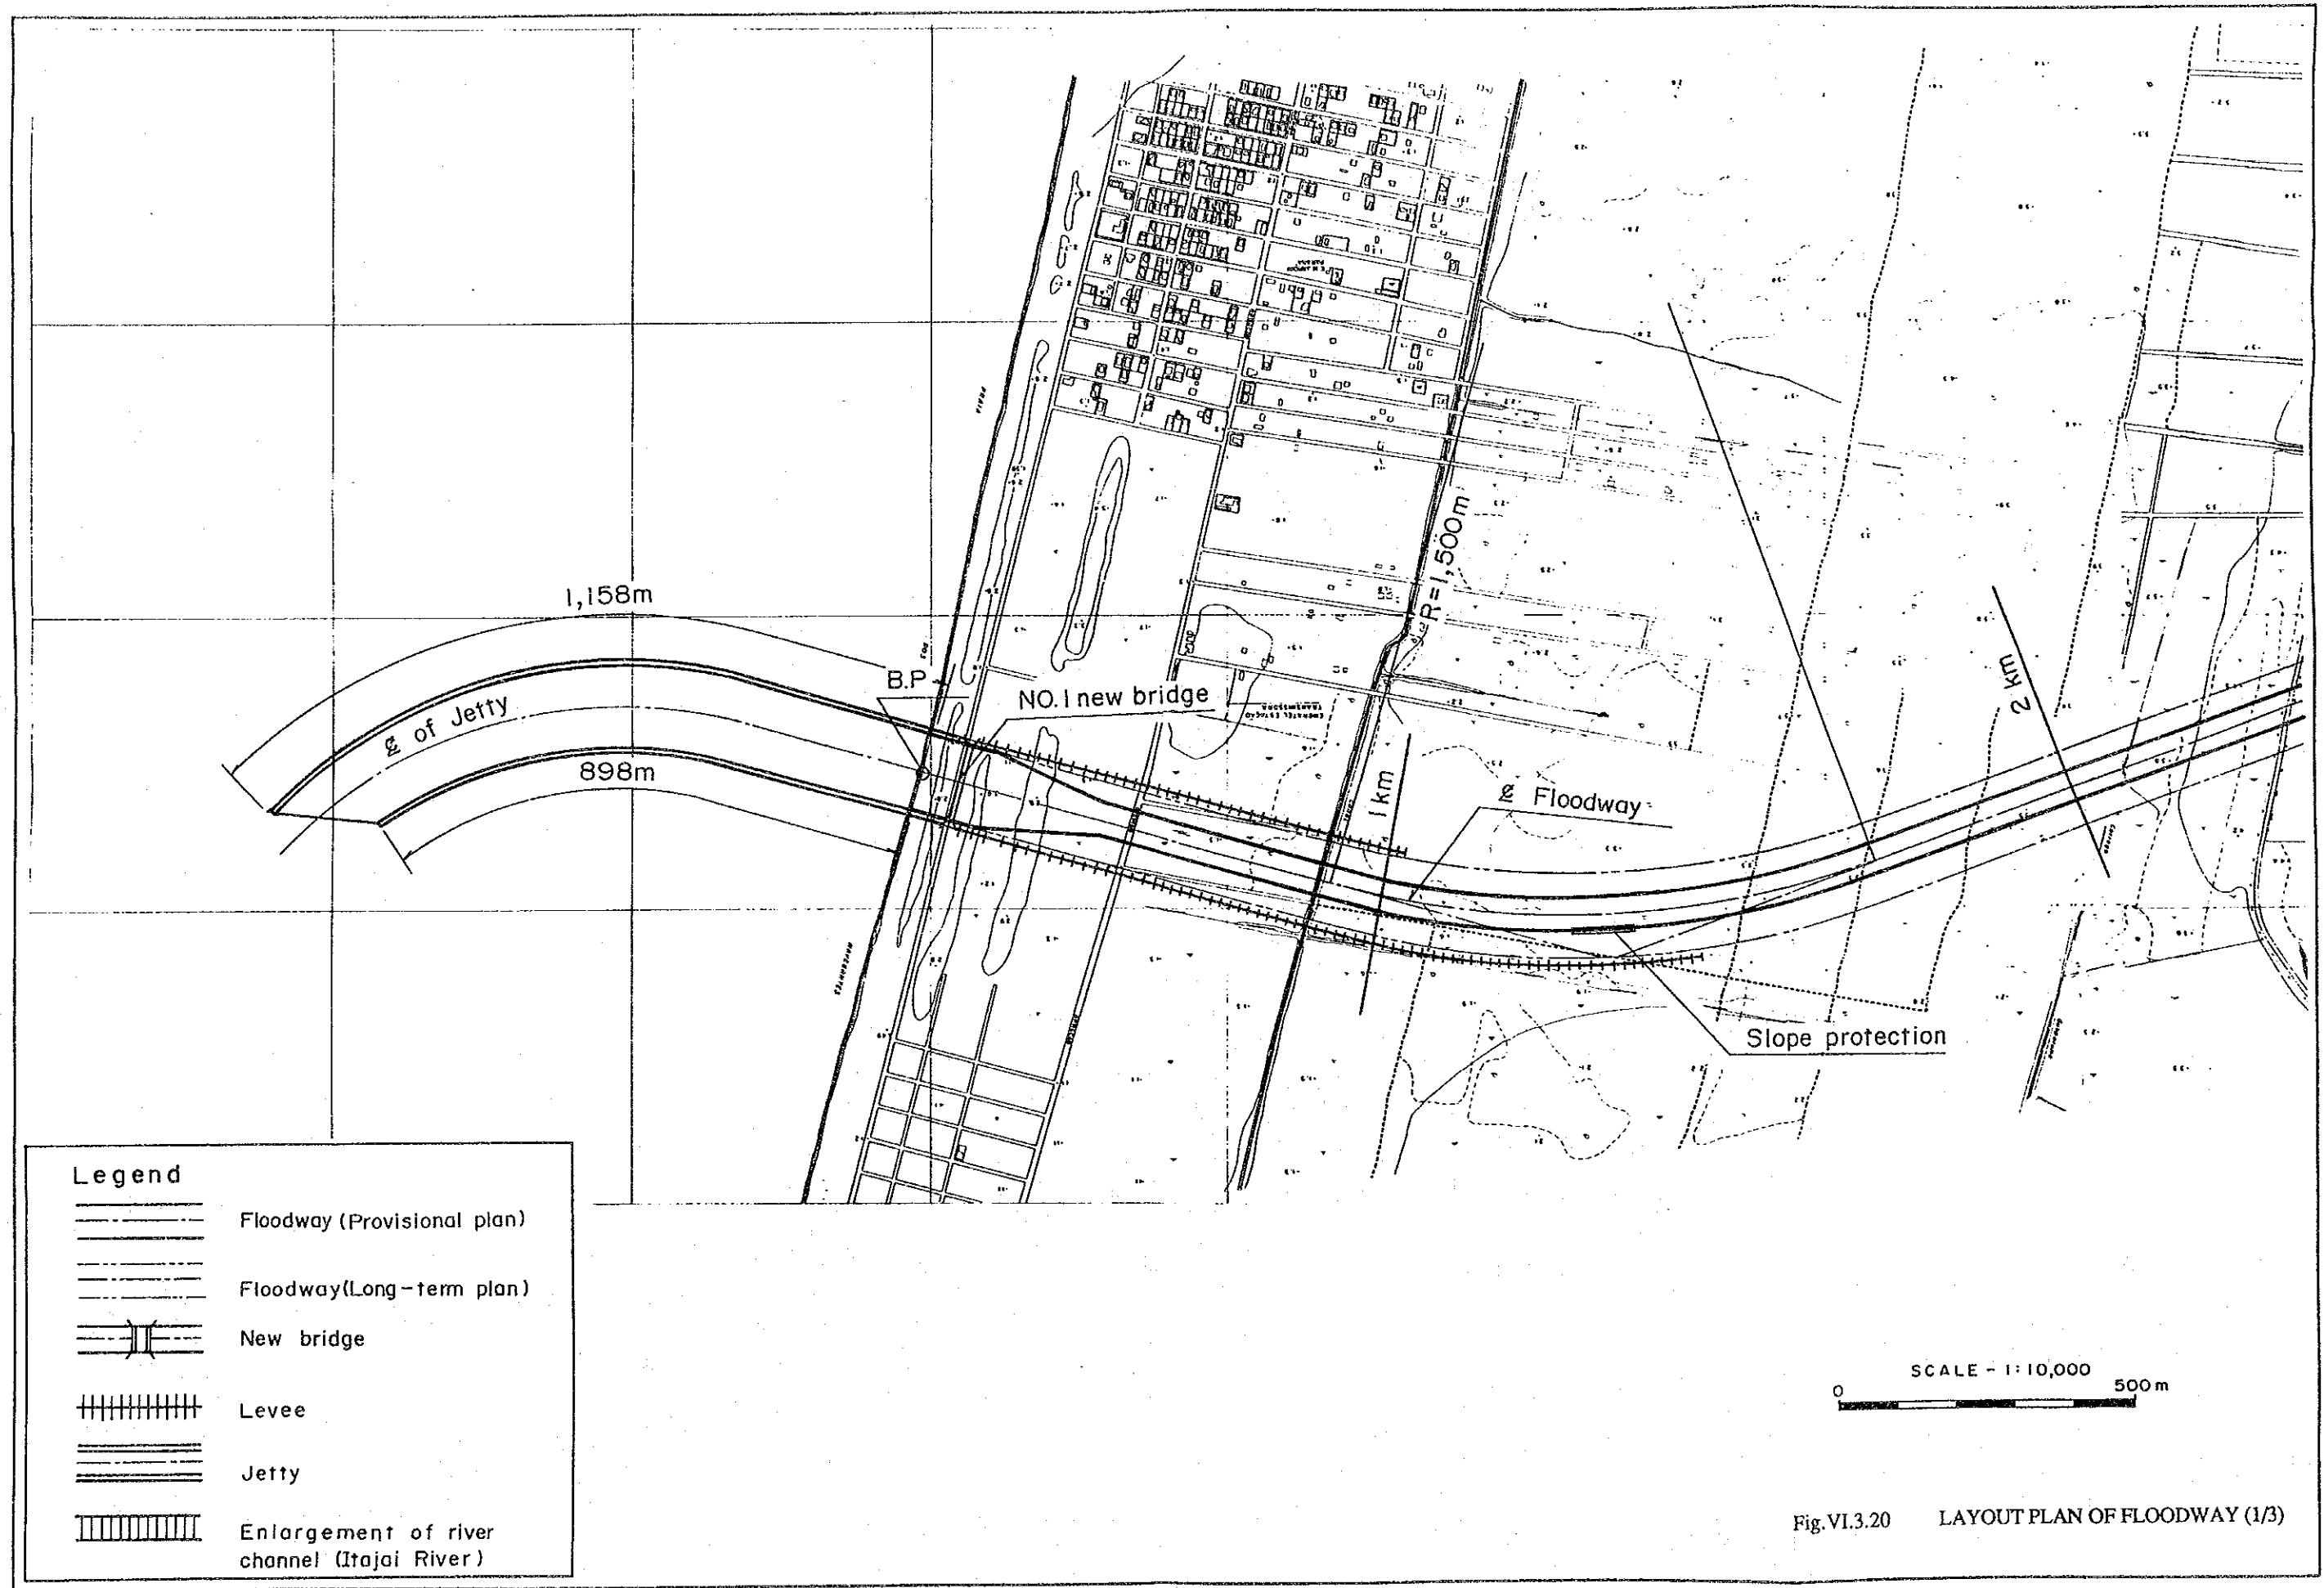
LAYOUT PLAN OF FLOODWAY (1/3)
